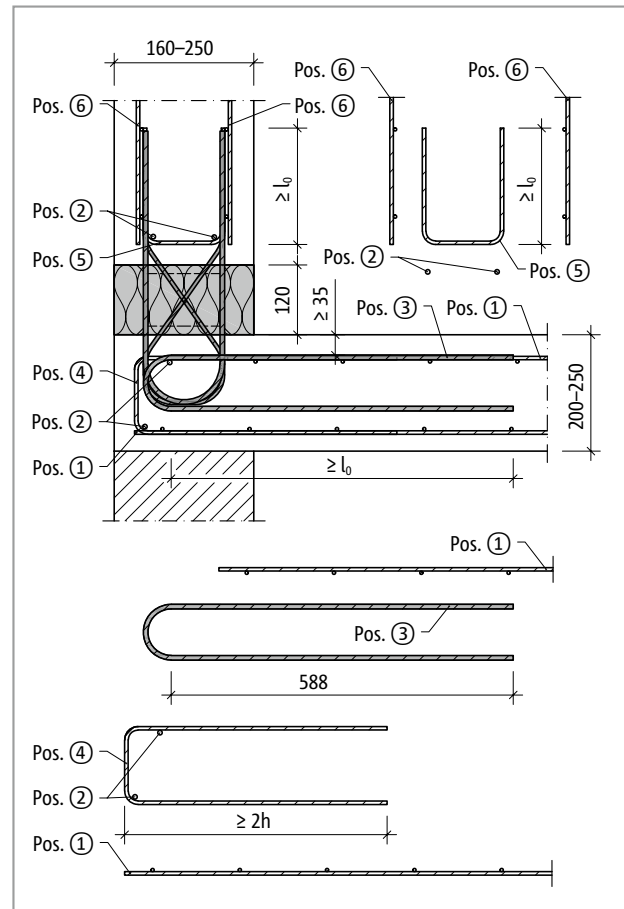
Schöck Isokorb® XT type A: On-site reinforcement outside
